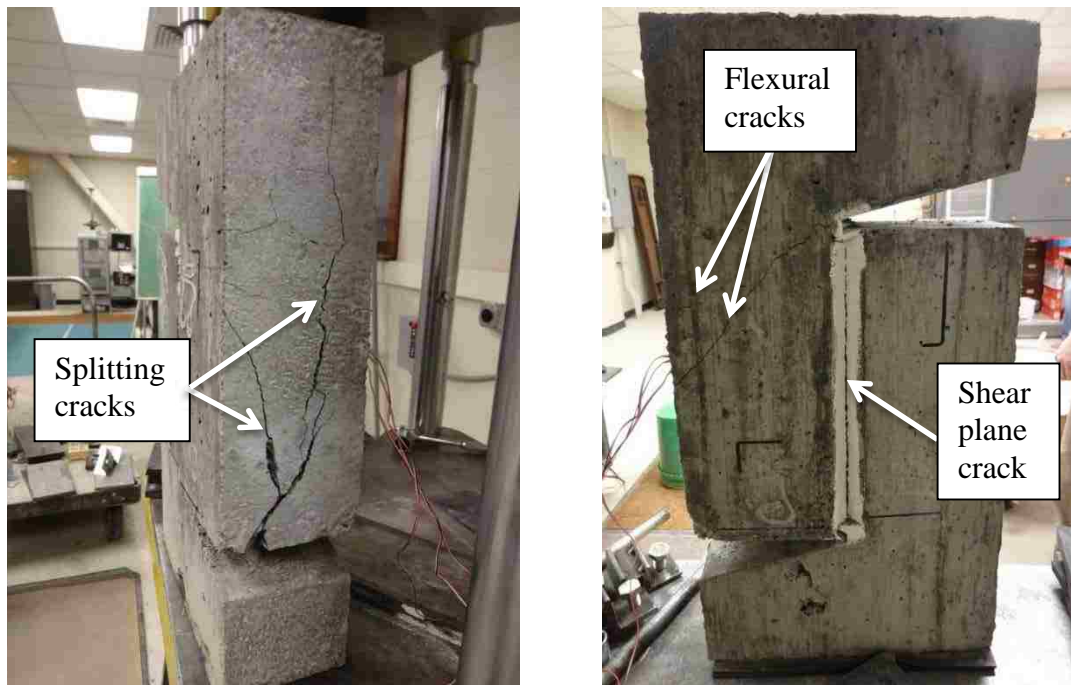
Typical cracking of specimens with higher reinforcement ratio that failed in shear along the shear plane; specimen S-SL-CJ-R-22-1 shown
